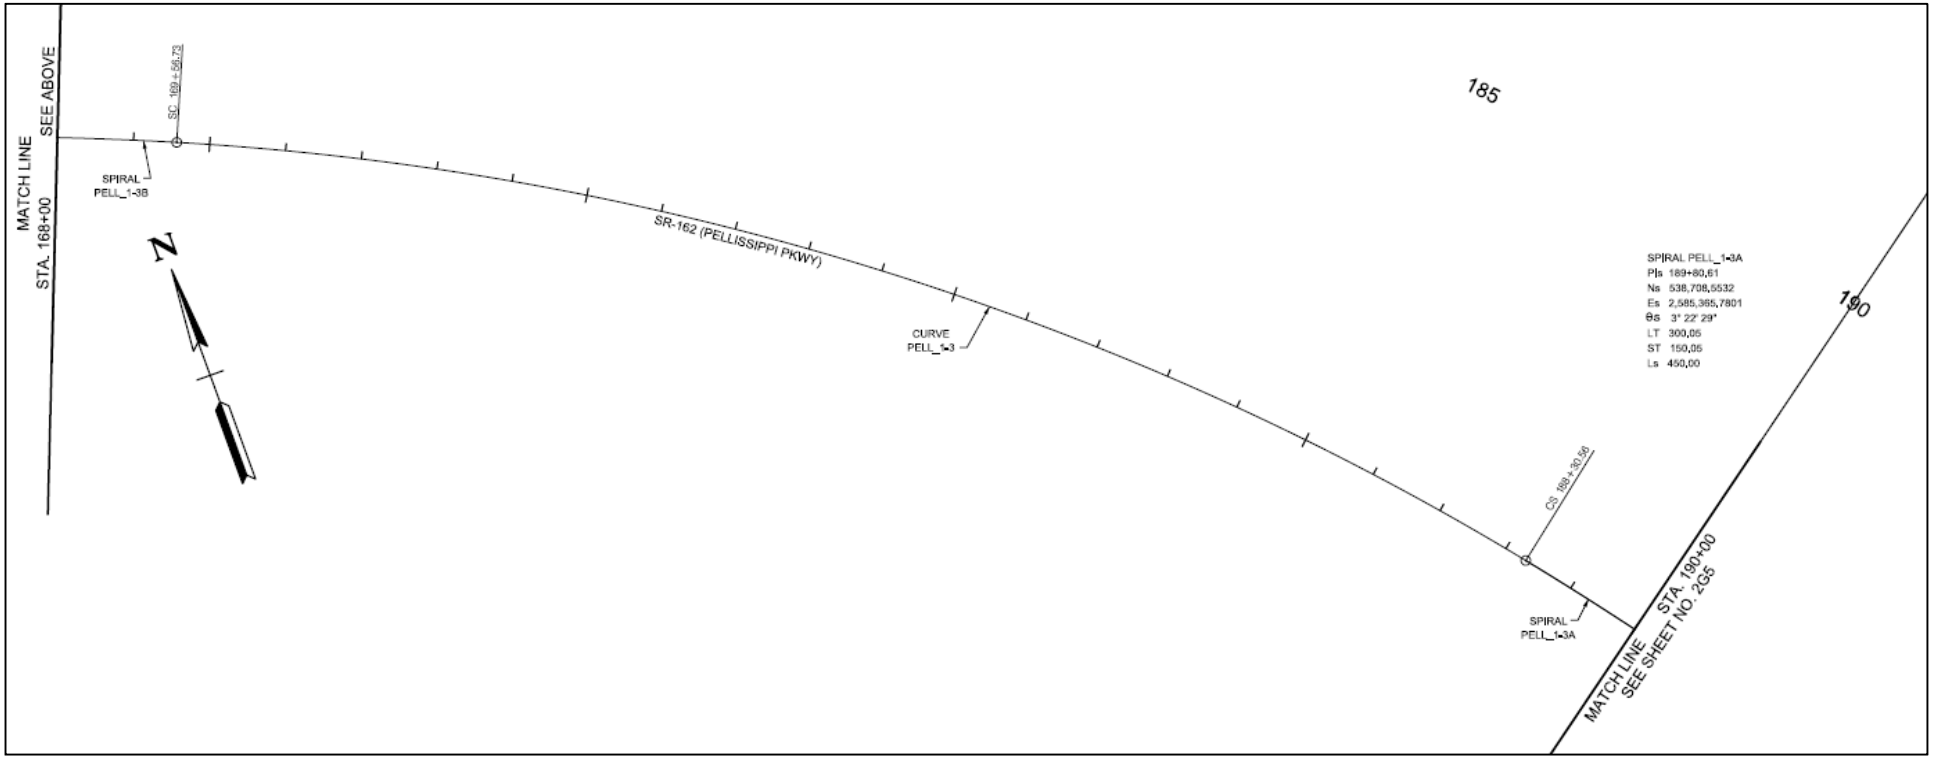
Overview 4 of 11 of the SR-162 Road Extension project from north to south.
